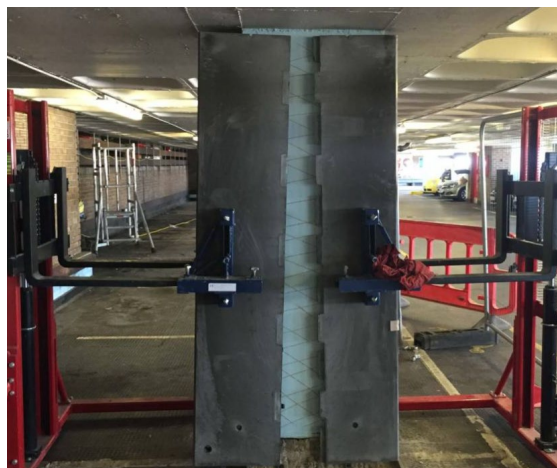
Precast UHPC column encasement (Ductal, 2020)
